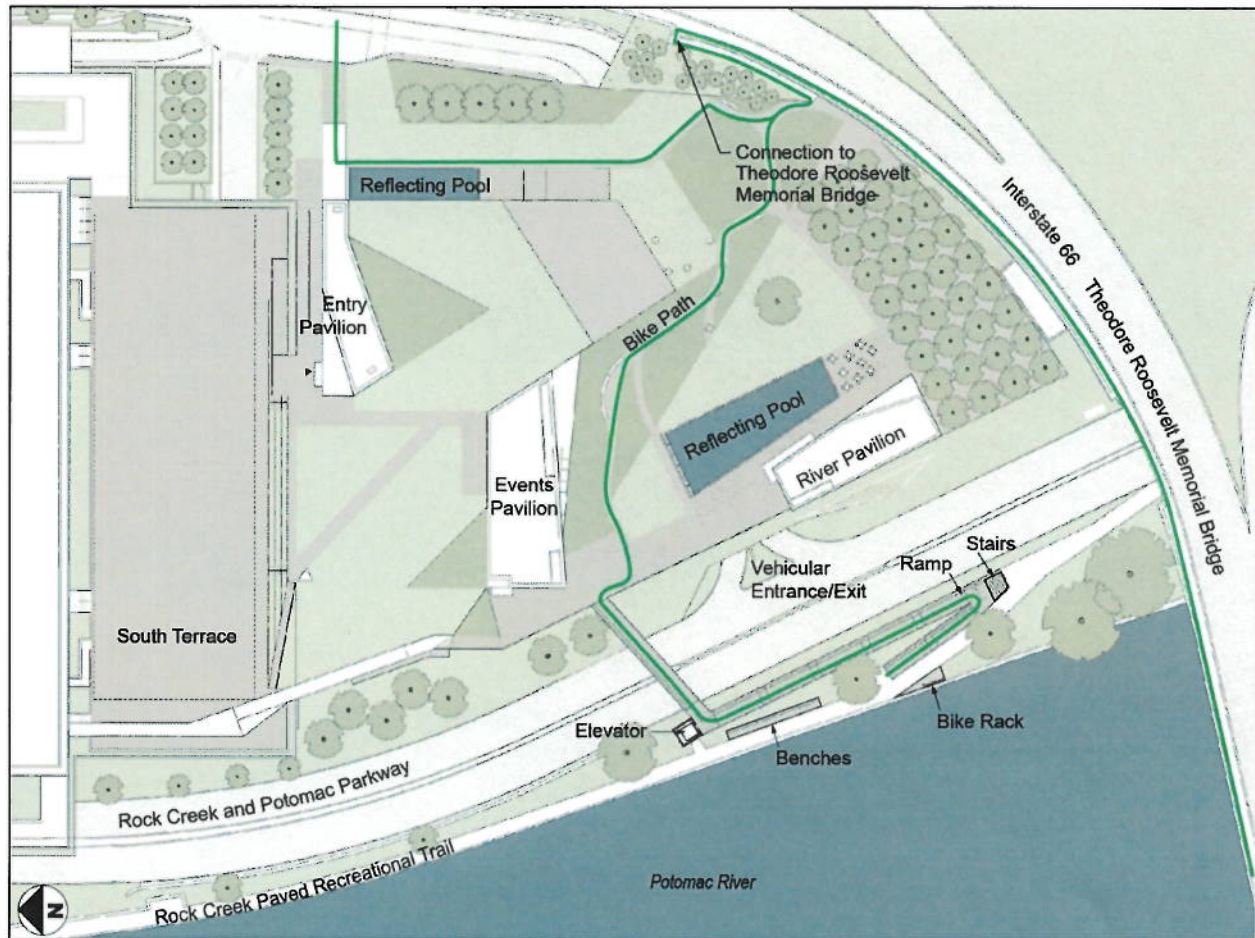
Alternative D - Bridge Access with Elevation and Ramp
